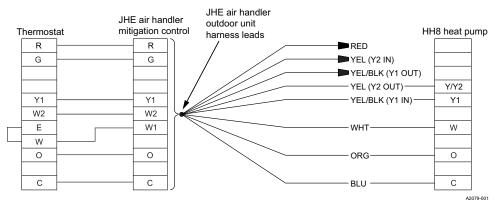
Control wiring diagram - standard ECM air handler and HH8 heat pump
